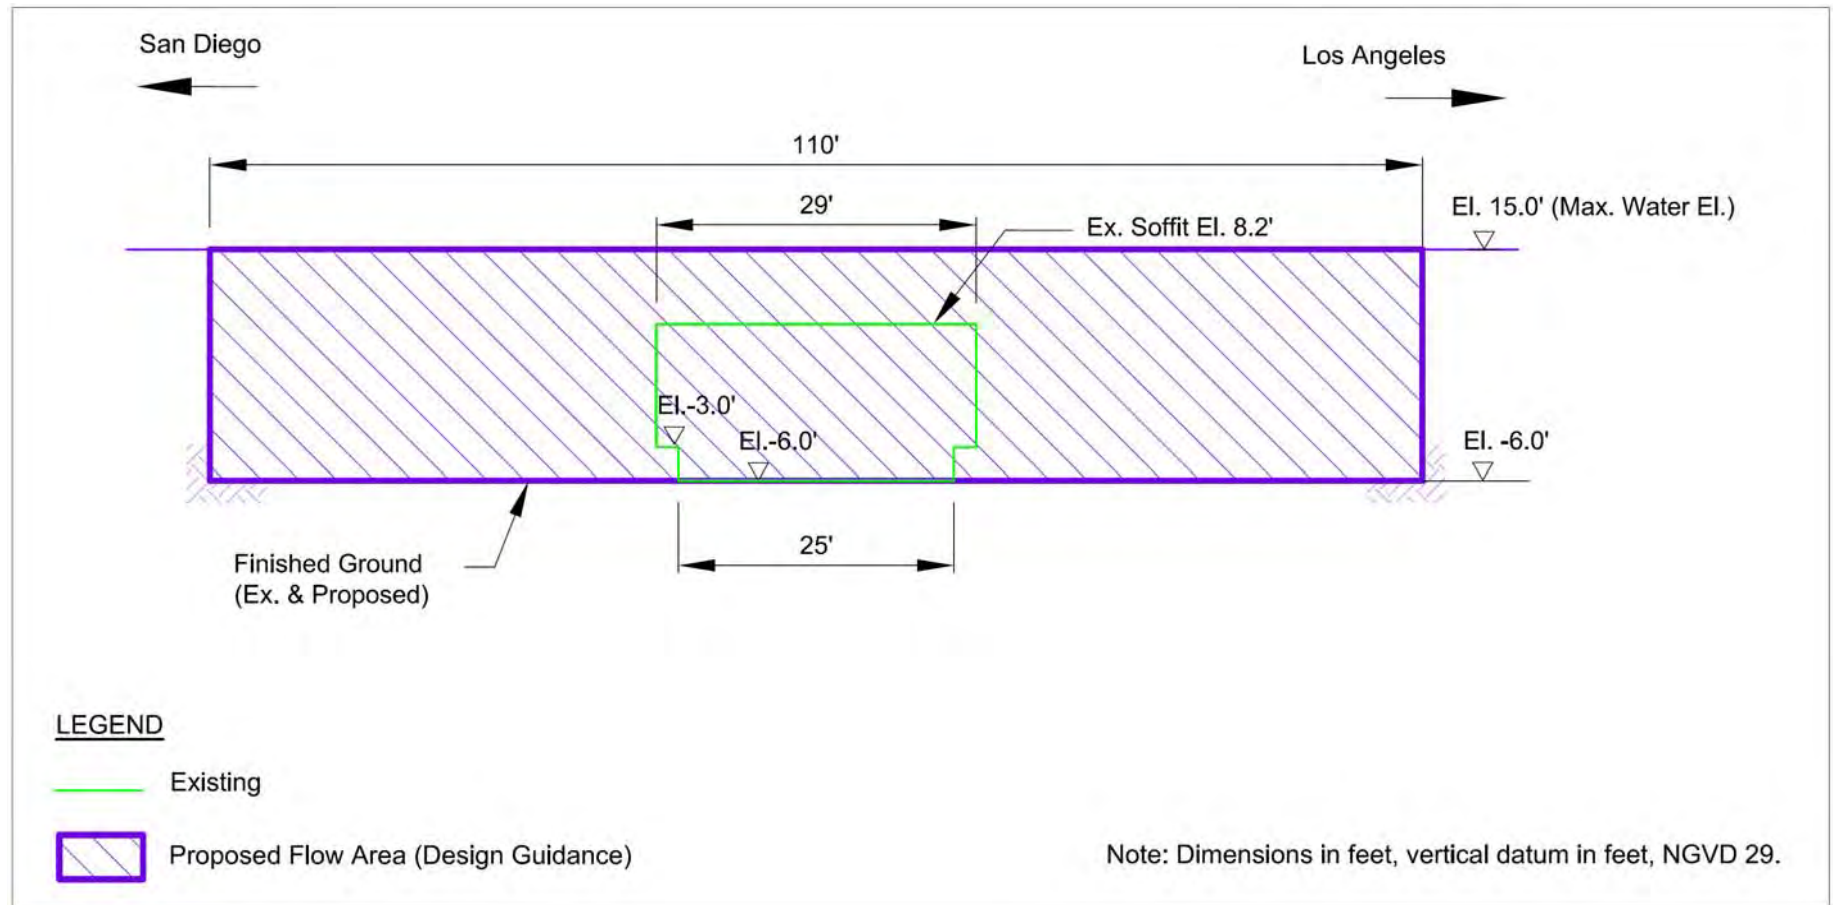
Design Guidance for Channel Cross Section of Coast Highway Bridge at Buena Vista Lagoon
